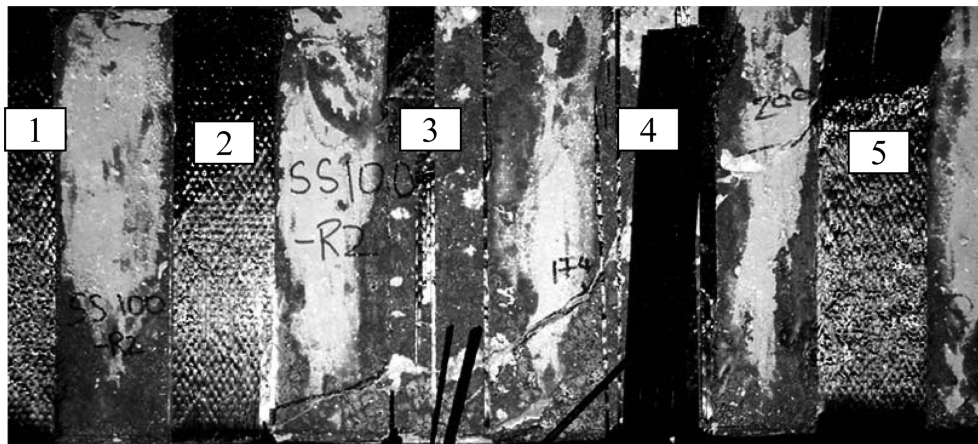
Concrete tensile strain, cracking and failure of strips for SS100
